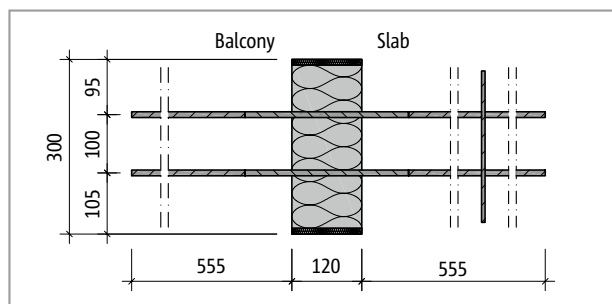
Schöck Isokorb® XT type Q-PZ-V1: Product plan view
